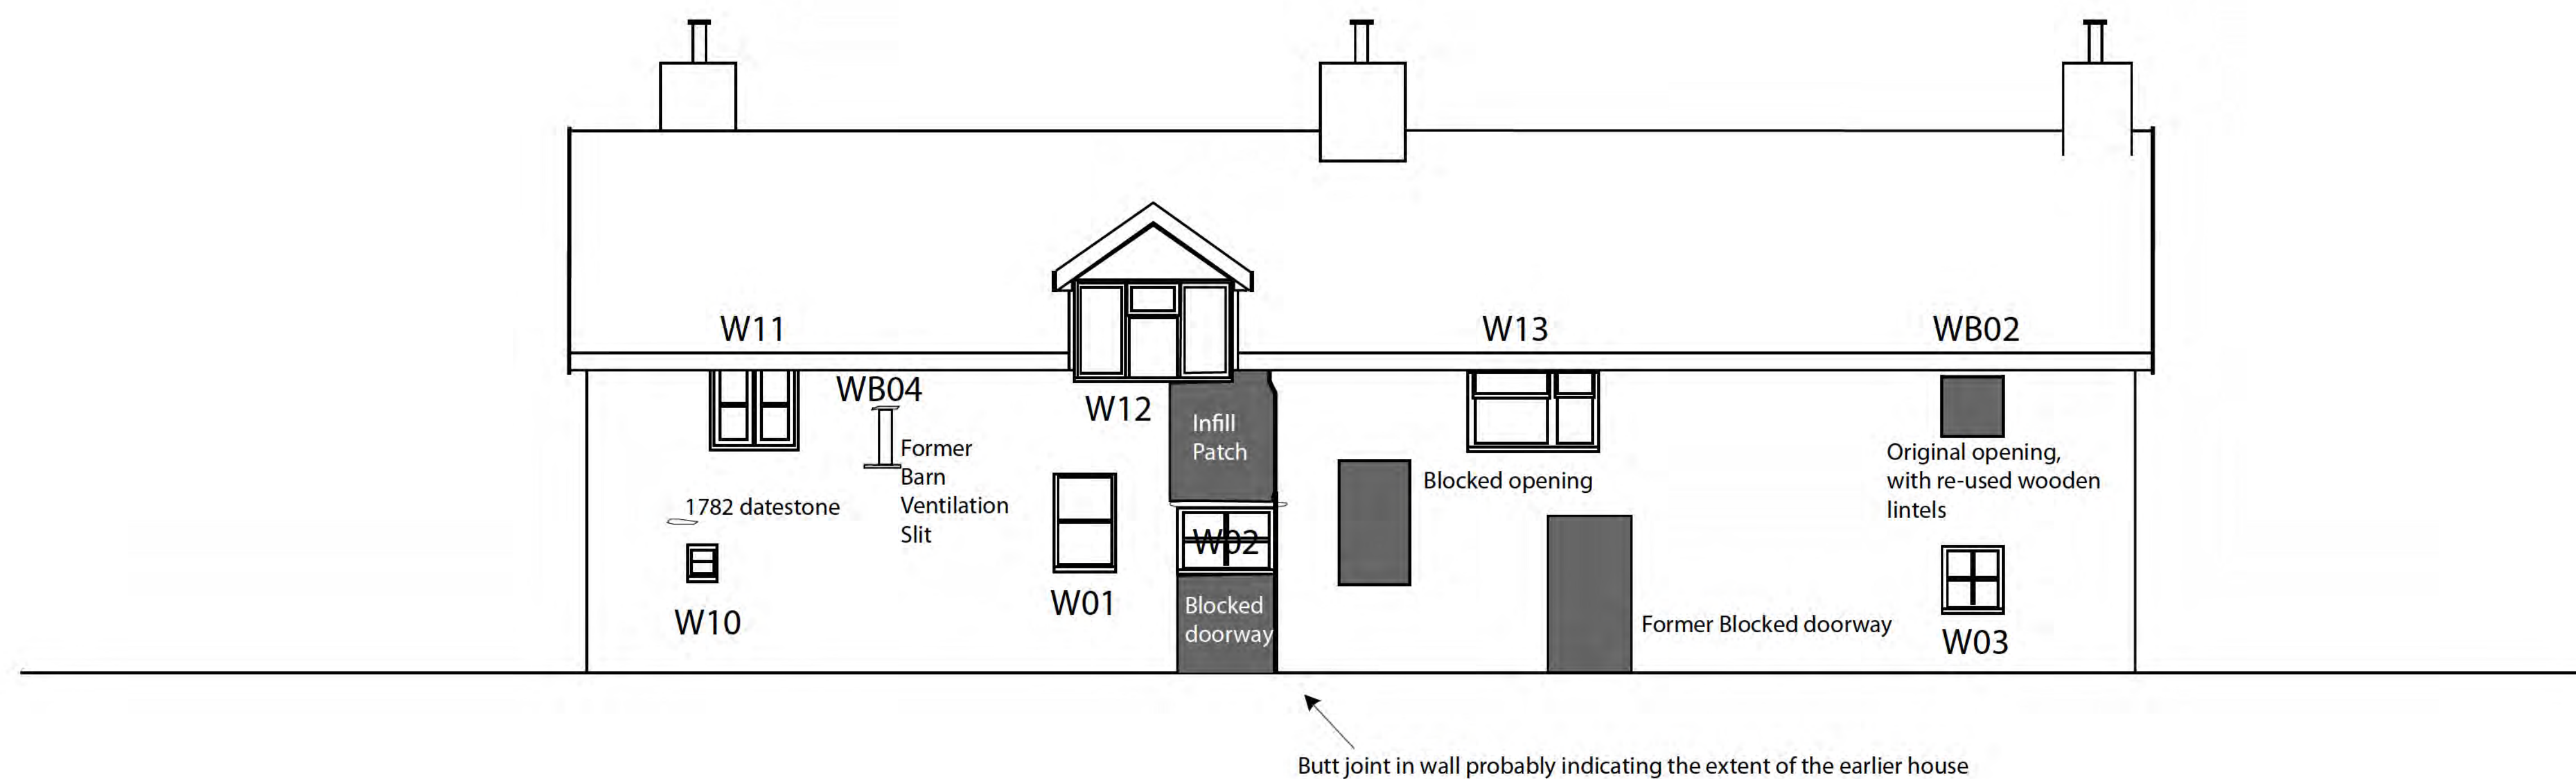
West Elevation (Existing). Based on Greenspace Architects Ltd Drawing No. 16-03 A004. Scale 1:100@A3
